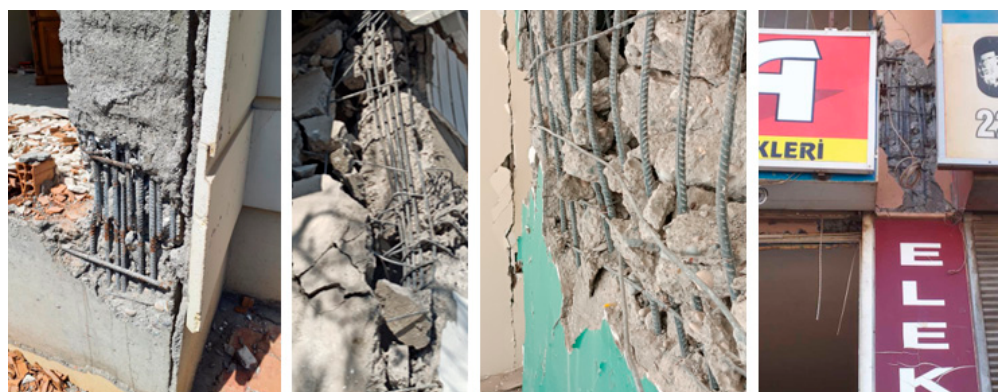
Examples of failed RS columns caused by poor reinforcement workmanship and insufficient transverse reinforcement.
